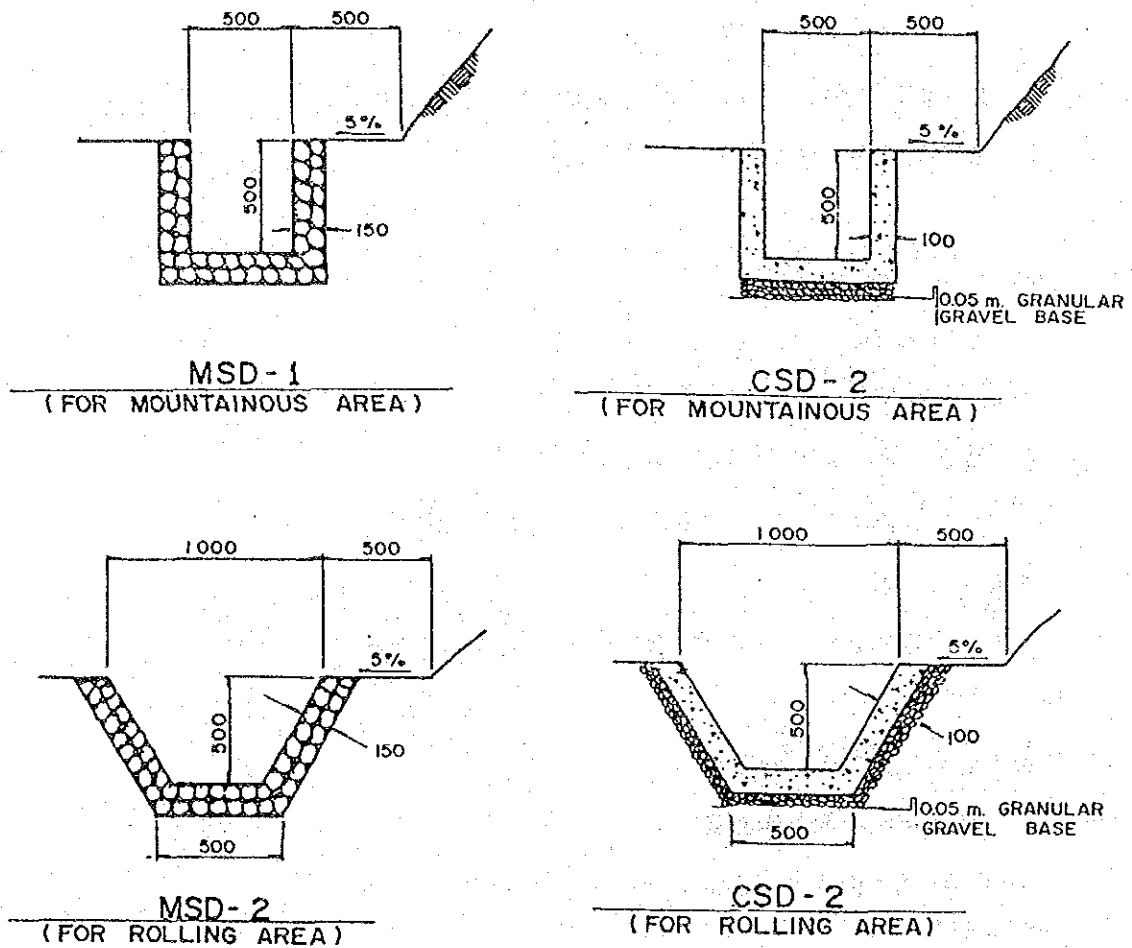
TYPICAL CROSS SECTION OF SIDE DITCH
